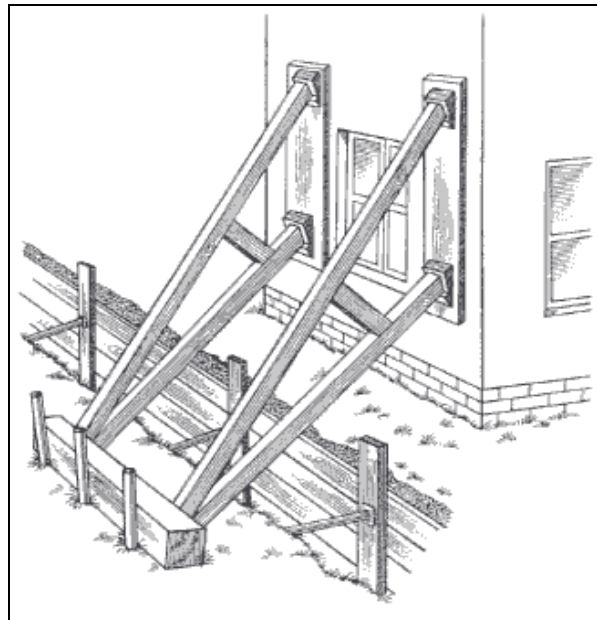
Excavation near a building: Shoring required to prevent collapse of the building
